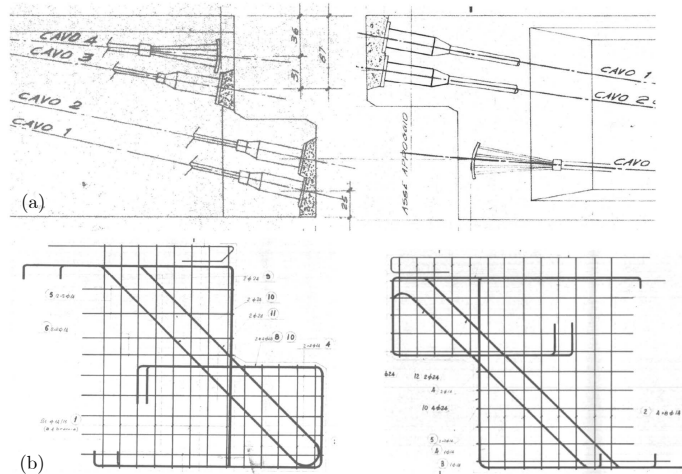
Dapped end girders: (a) prestressing cables and (b) longitudinal and transversal reinforcement.
